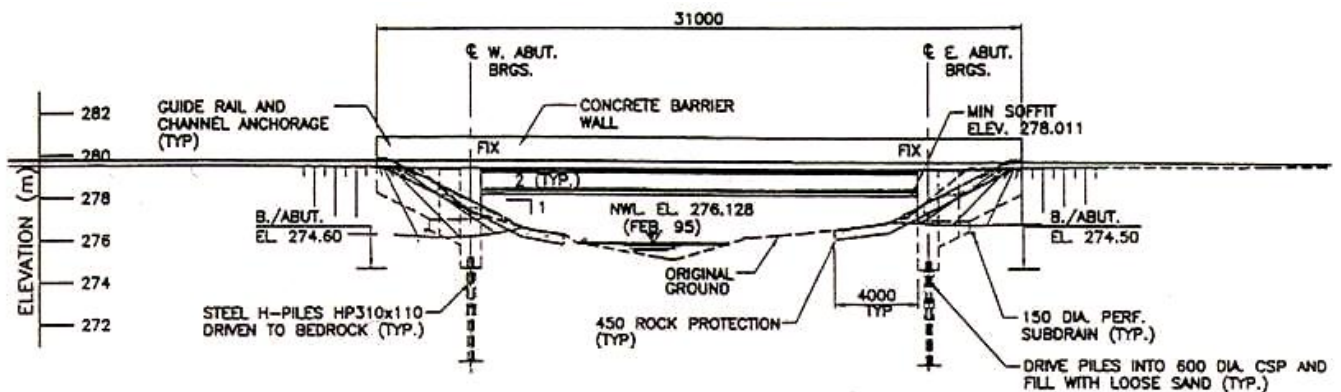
Elevation view of the Moose Creek Bridge
